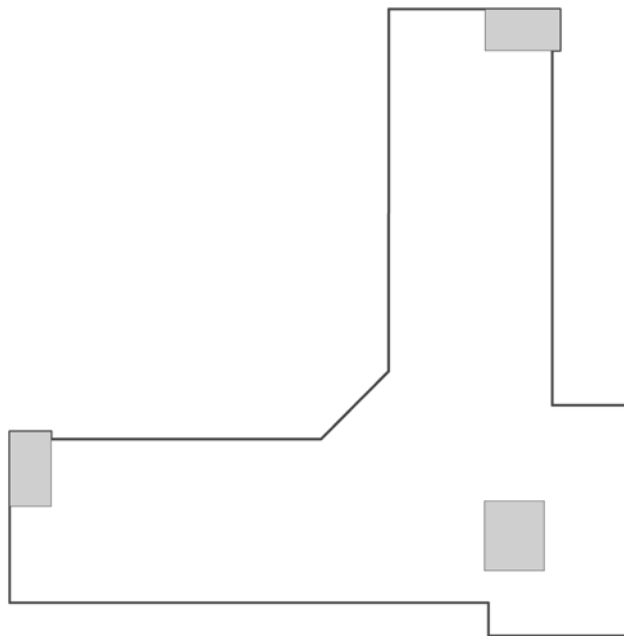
Planning Activity Blank Floor Plan. Image Credit- Author.
